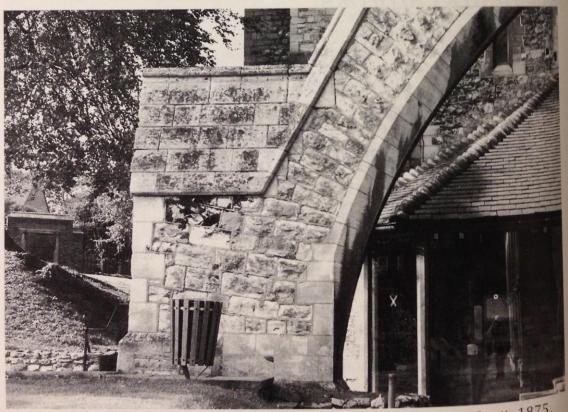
Plate II. Flying buttress to wall of south choir aisle, by Gilbert Scott, 1875. Kenish Rag with dressings of Chilmark stone.
